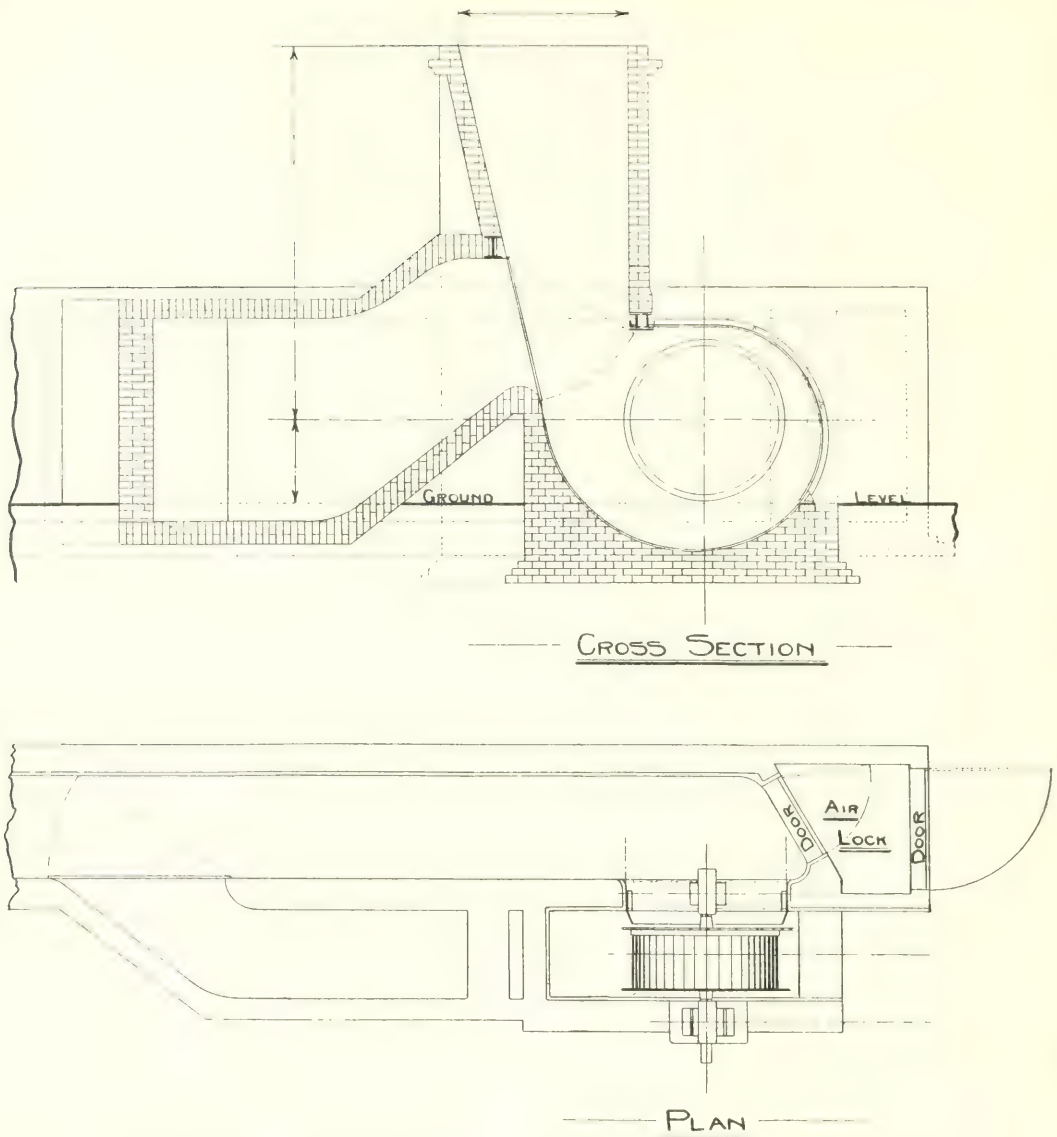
PLAN AND CROSS-SECTION OF SIROCCO FAN ARRANGED FOR REVERSAL.
